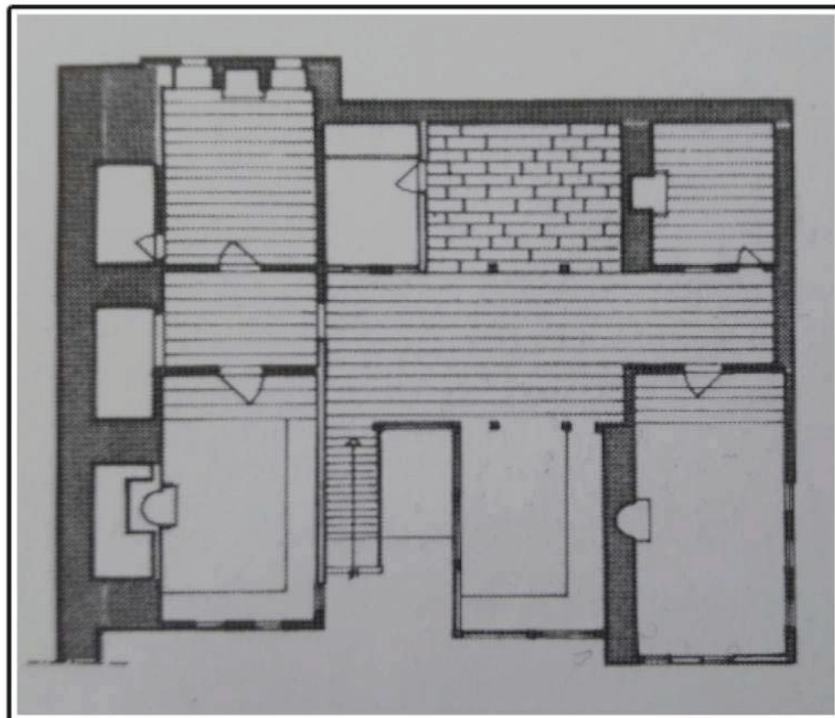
First floor plan of the selamlık section in Güpgüpoğlu house.
